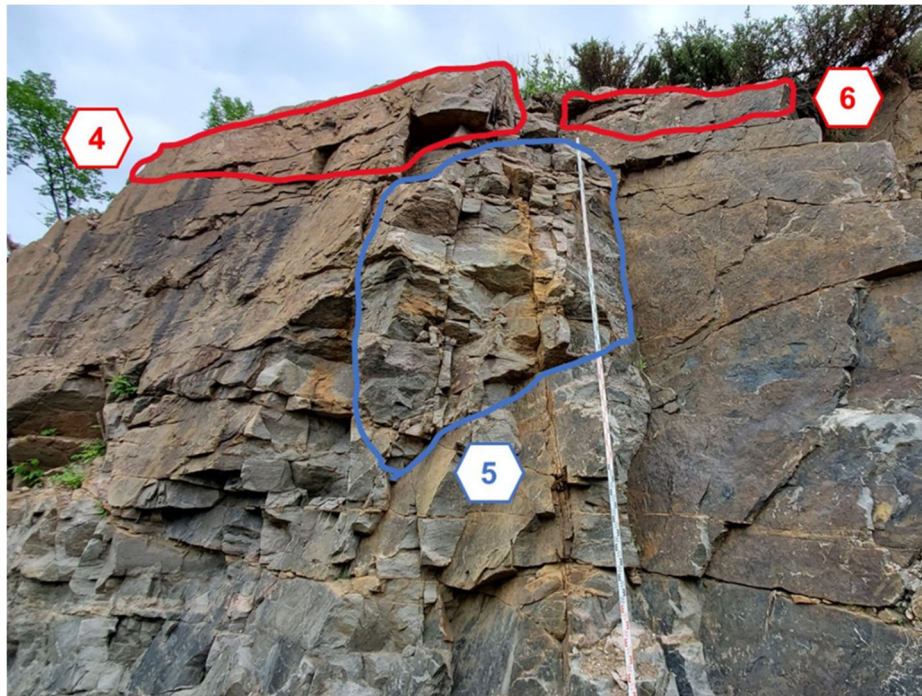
Existing Rock Cut Site E-17-1, near 12+640 Left (2020/06/09)
